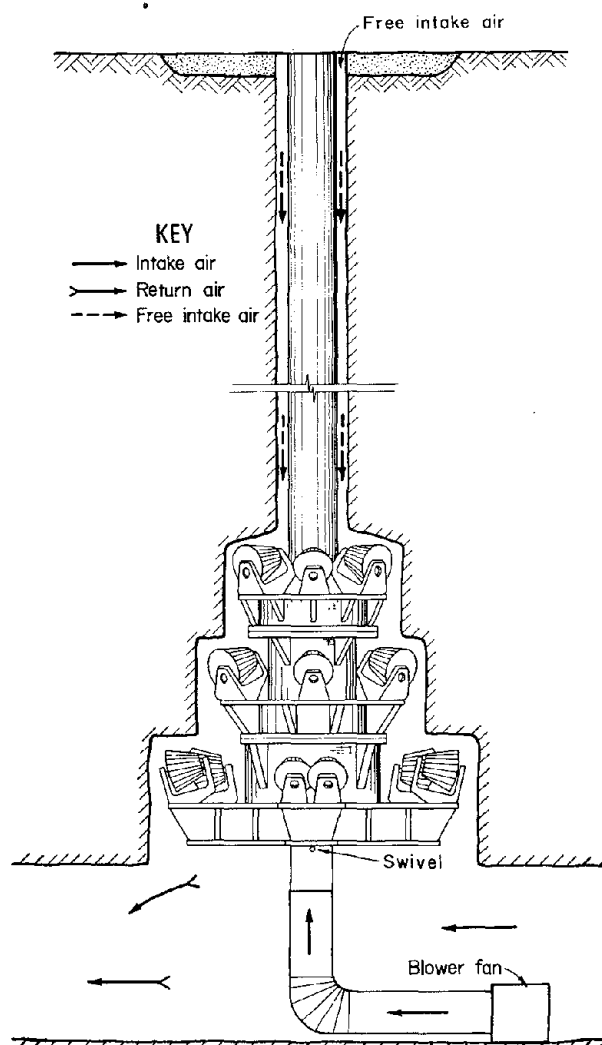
Temporary use of auxiliary blower fan at shaft bottom.
